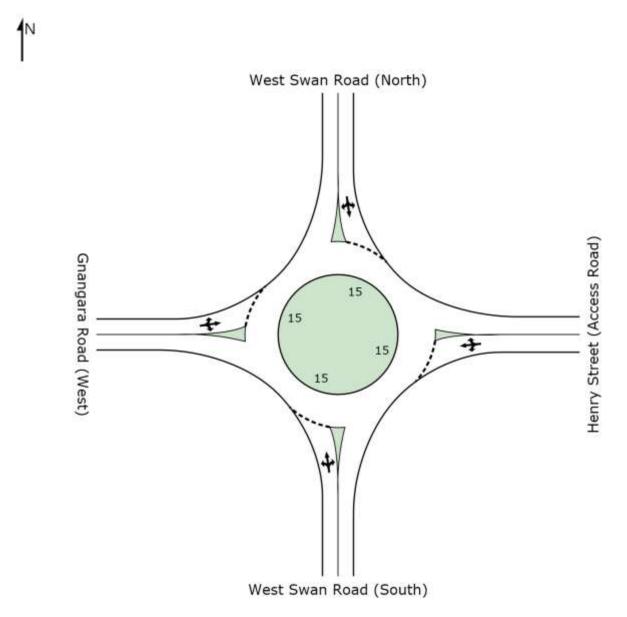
Assumed Intersection Layout of Gnangara Road and West Swan Road
